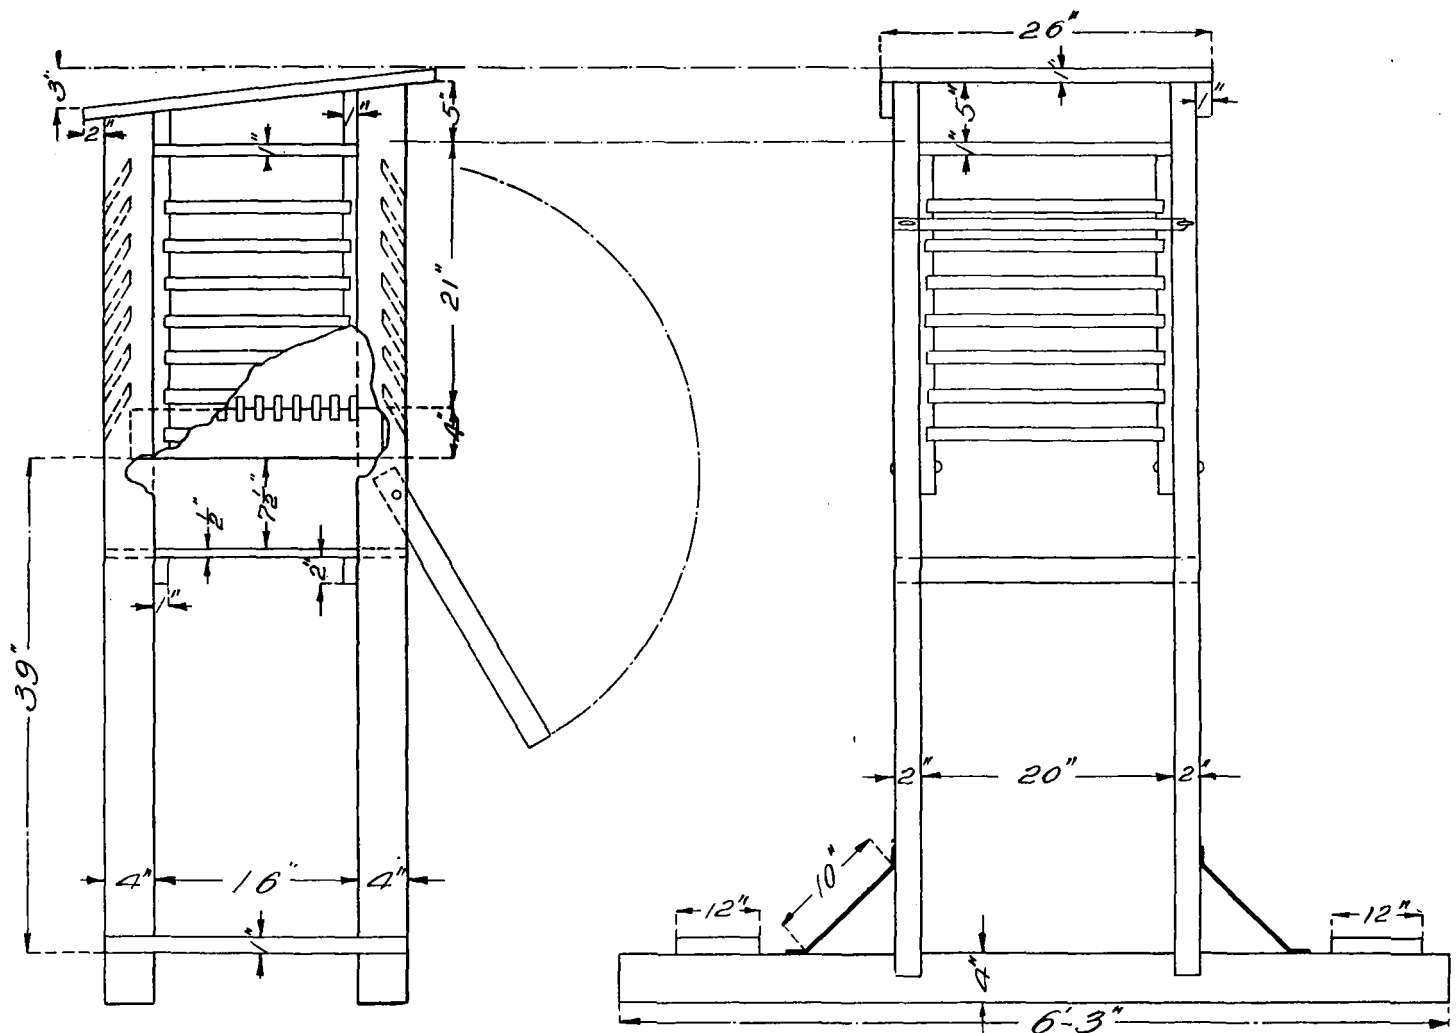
Construction plan of instrument shelter for use on Mount Rose. (Slightly reduced from the working drawings.)
